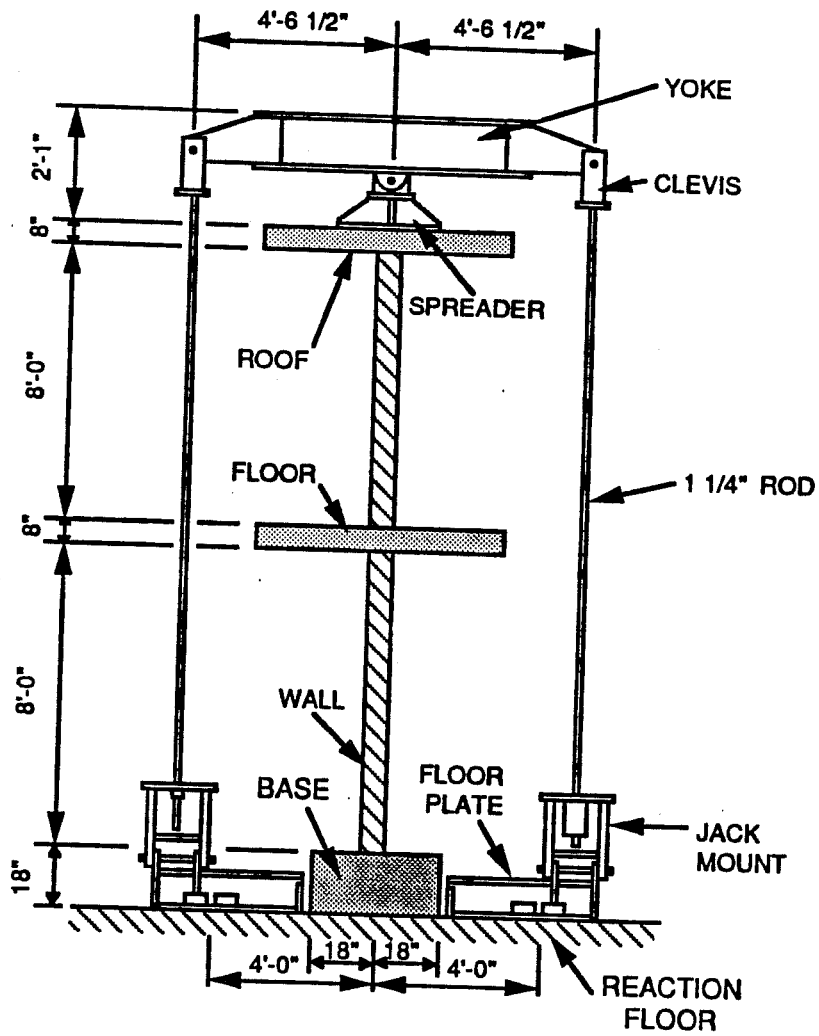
Vertical Loading Frame (Specimen 2a only)
